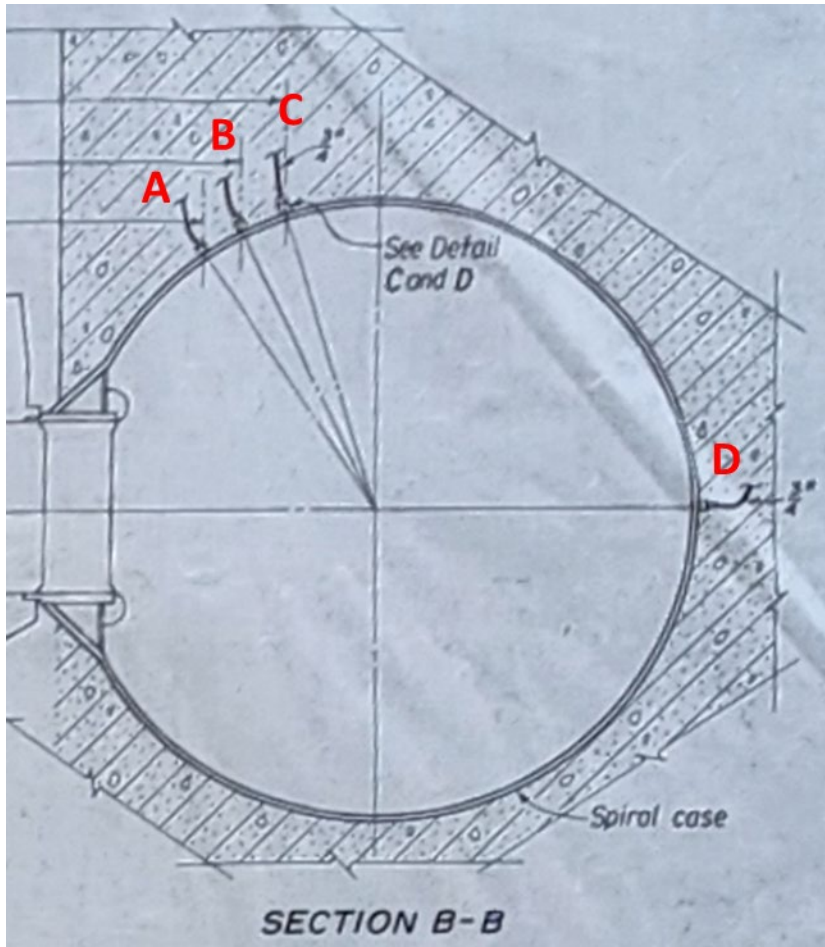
Cross section view of WK pressure taps for unit G24 from drawing 1222-D-3686.
